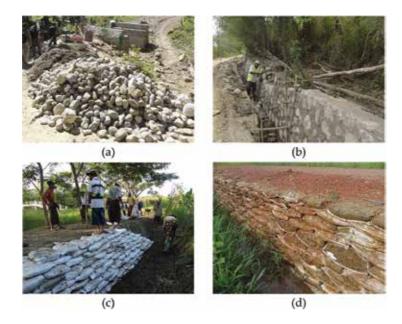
Construction of retaining wall: (a) Material for retaining wall with masonry; (b) construction of retaining wall by masonry; (c) construction of retaining wall with Do-nou; (d) torn bags and cemented material inside bags.
